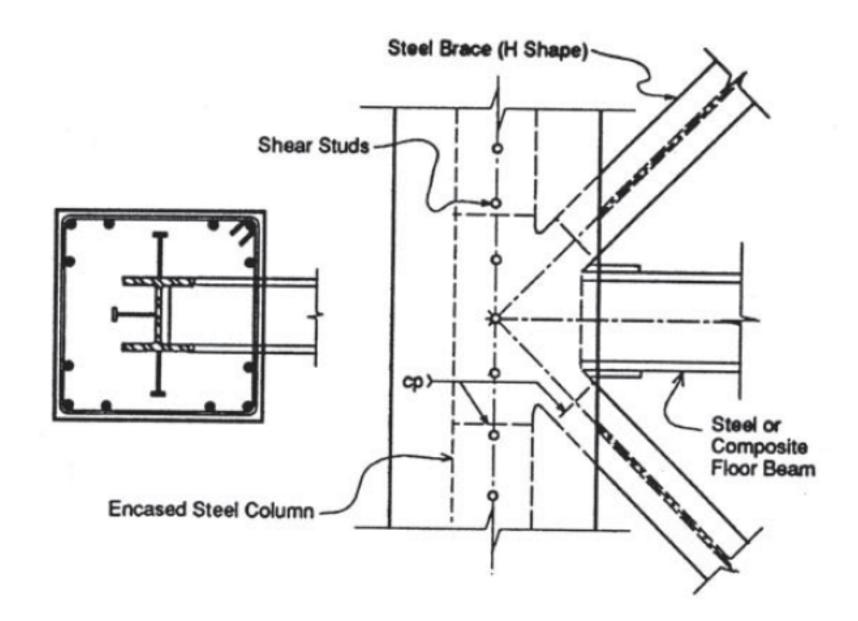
Reinforced concrete (or composite) column-to-steel concentric brace.
